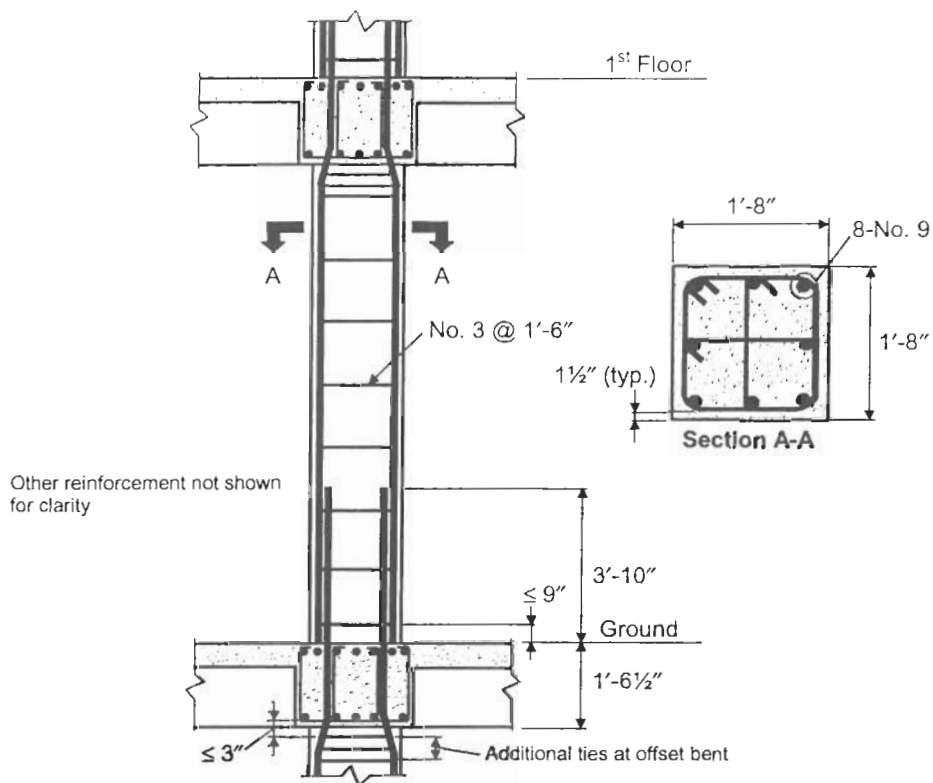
Reinforcement Details for Column C3 Supporting the 1<sup>st</sup> Floor Level (SDC B)
